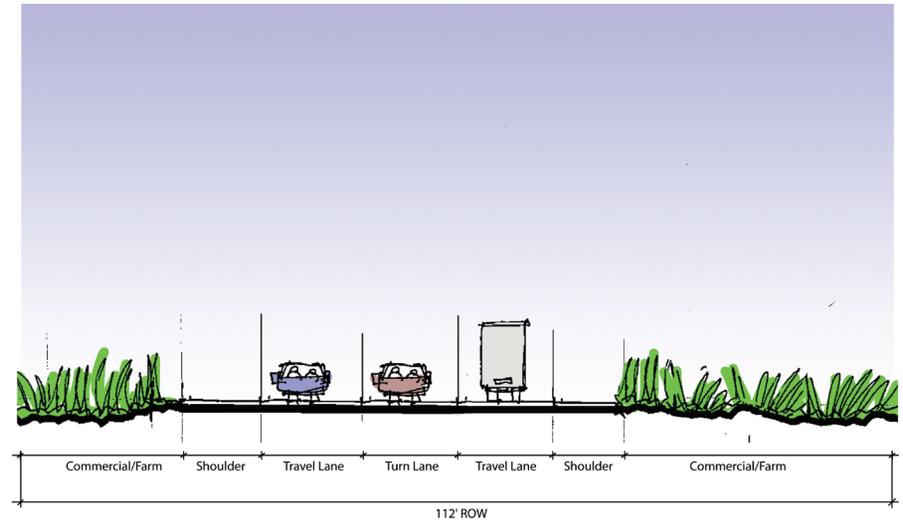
CROSS SECTION OF EXISTING CORRIDOR
